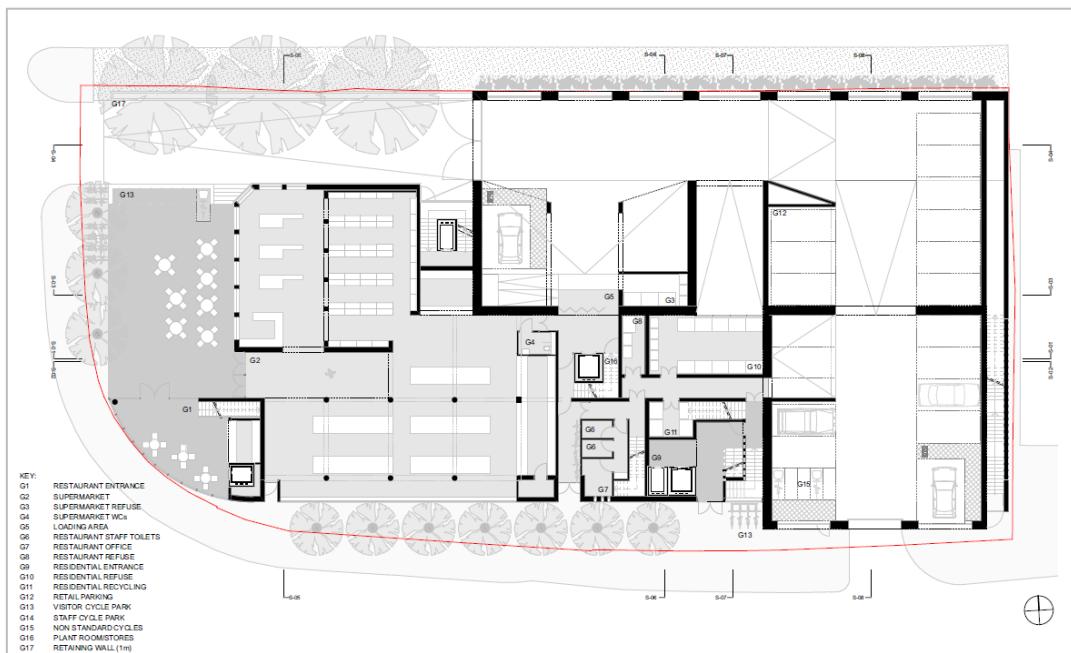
Proposed Ground Floor Plan – Sutherland Hussey Harris and NArch London (Sept 2019)
